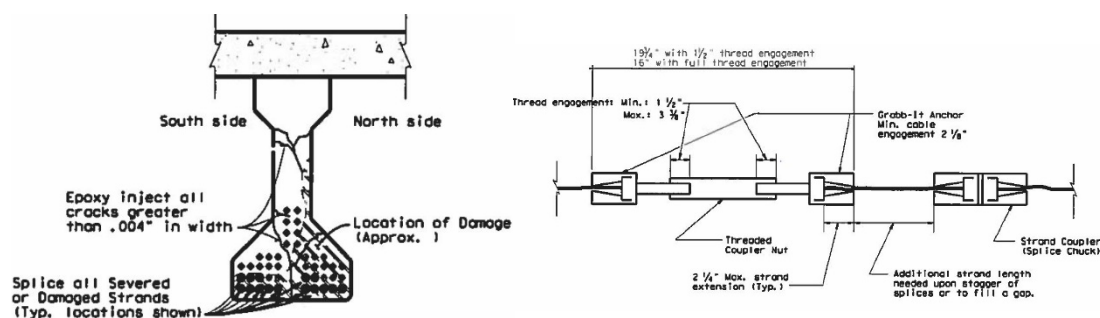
(a) Beam B3 concrete and strand damage (b) Schematic of Splice repair installation
